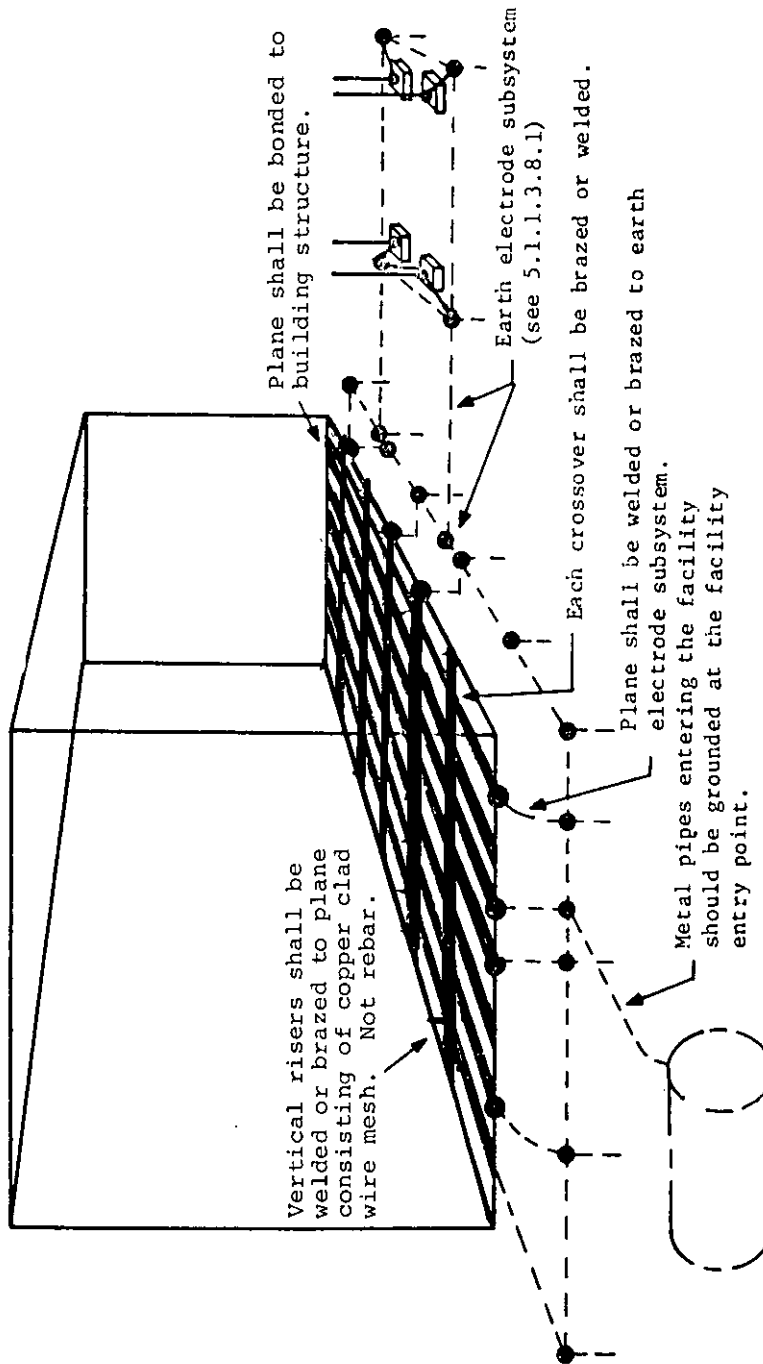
Example of Equipotential Plane to Earth Electrode Subsystem (for New Construction)
